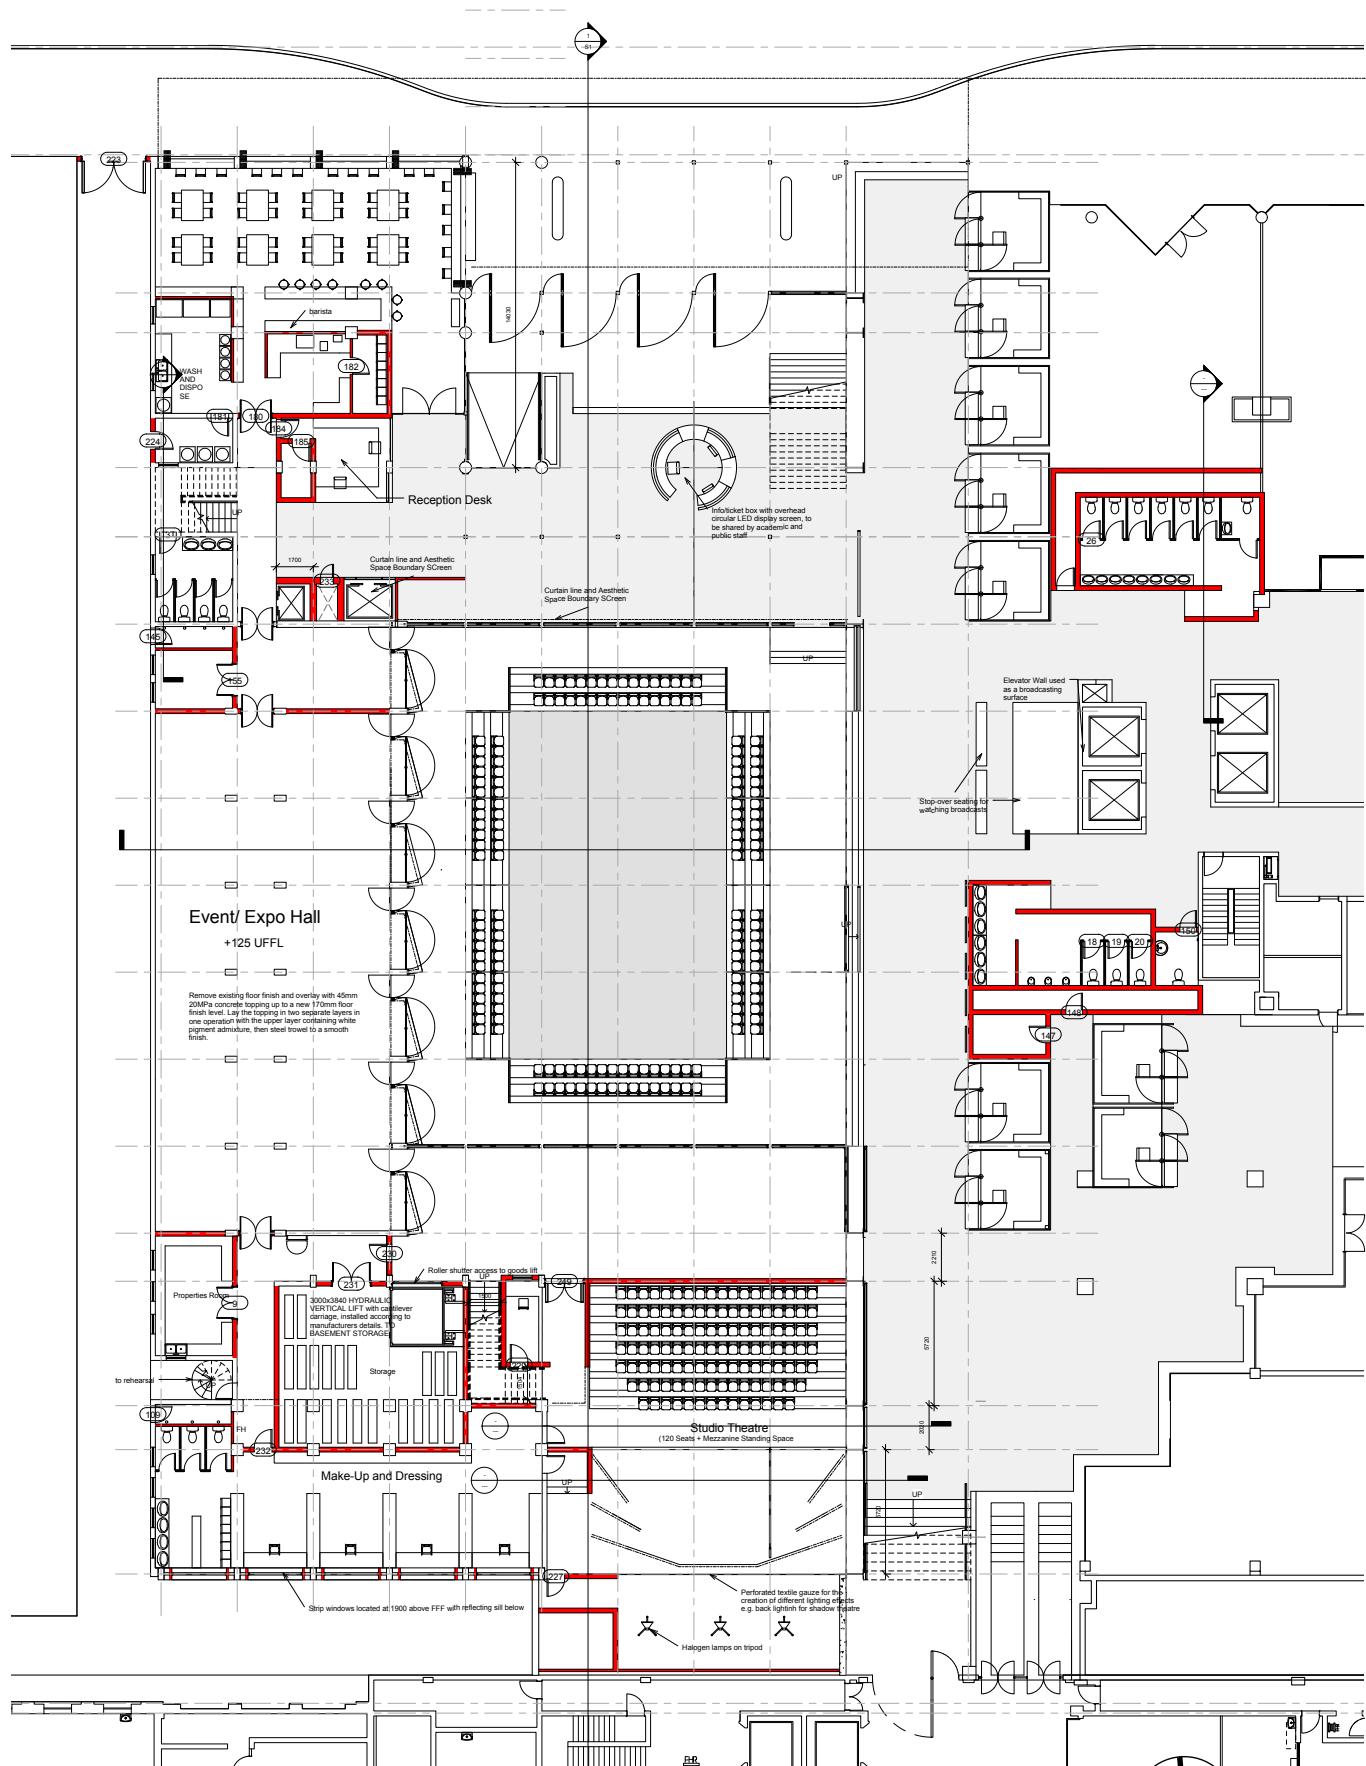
GROUND FLOOR PLAN (more developed)
